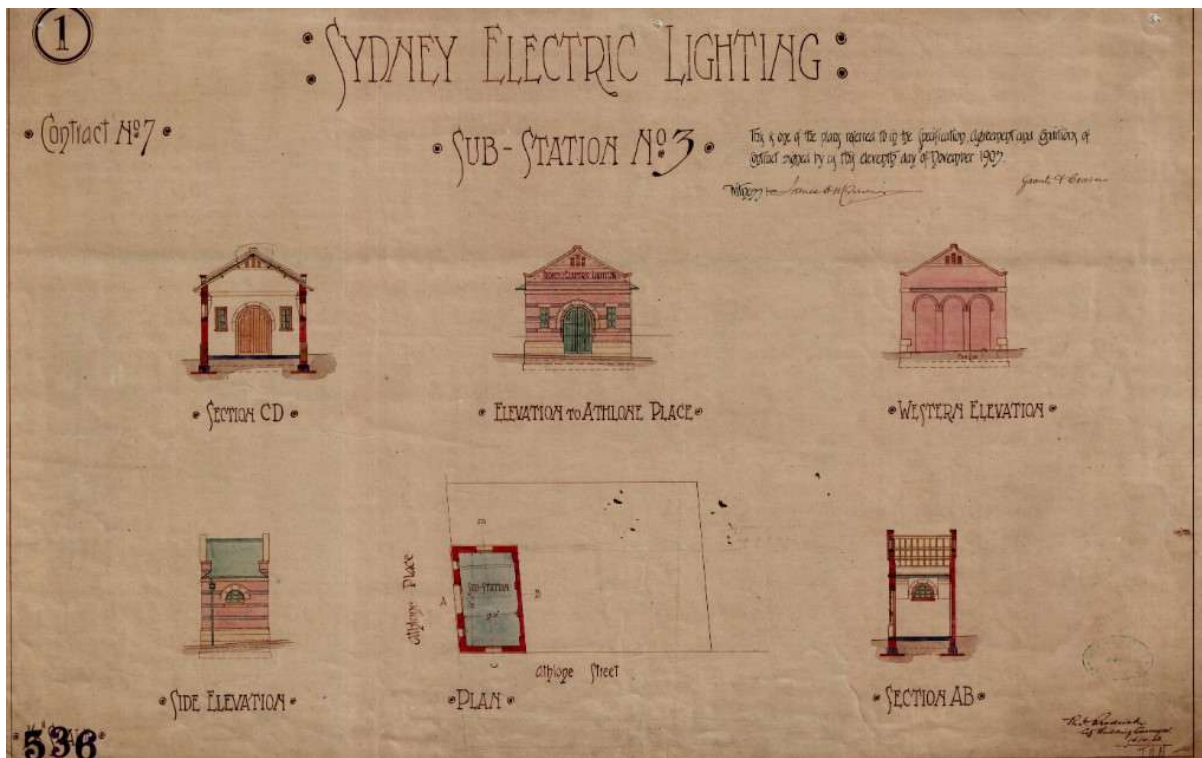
A plan dated c.1903 of the Sydney Electric Lighting Substation No.3 drawn and surveyed by City Architect and surveyor Robert Hargreave Brodrick, located on the corner of Athlone Place and Athlone Street, Ultimo (within the subject site).
